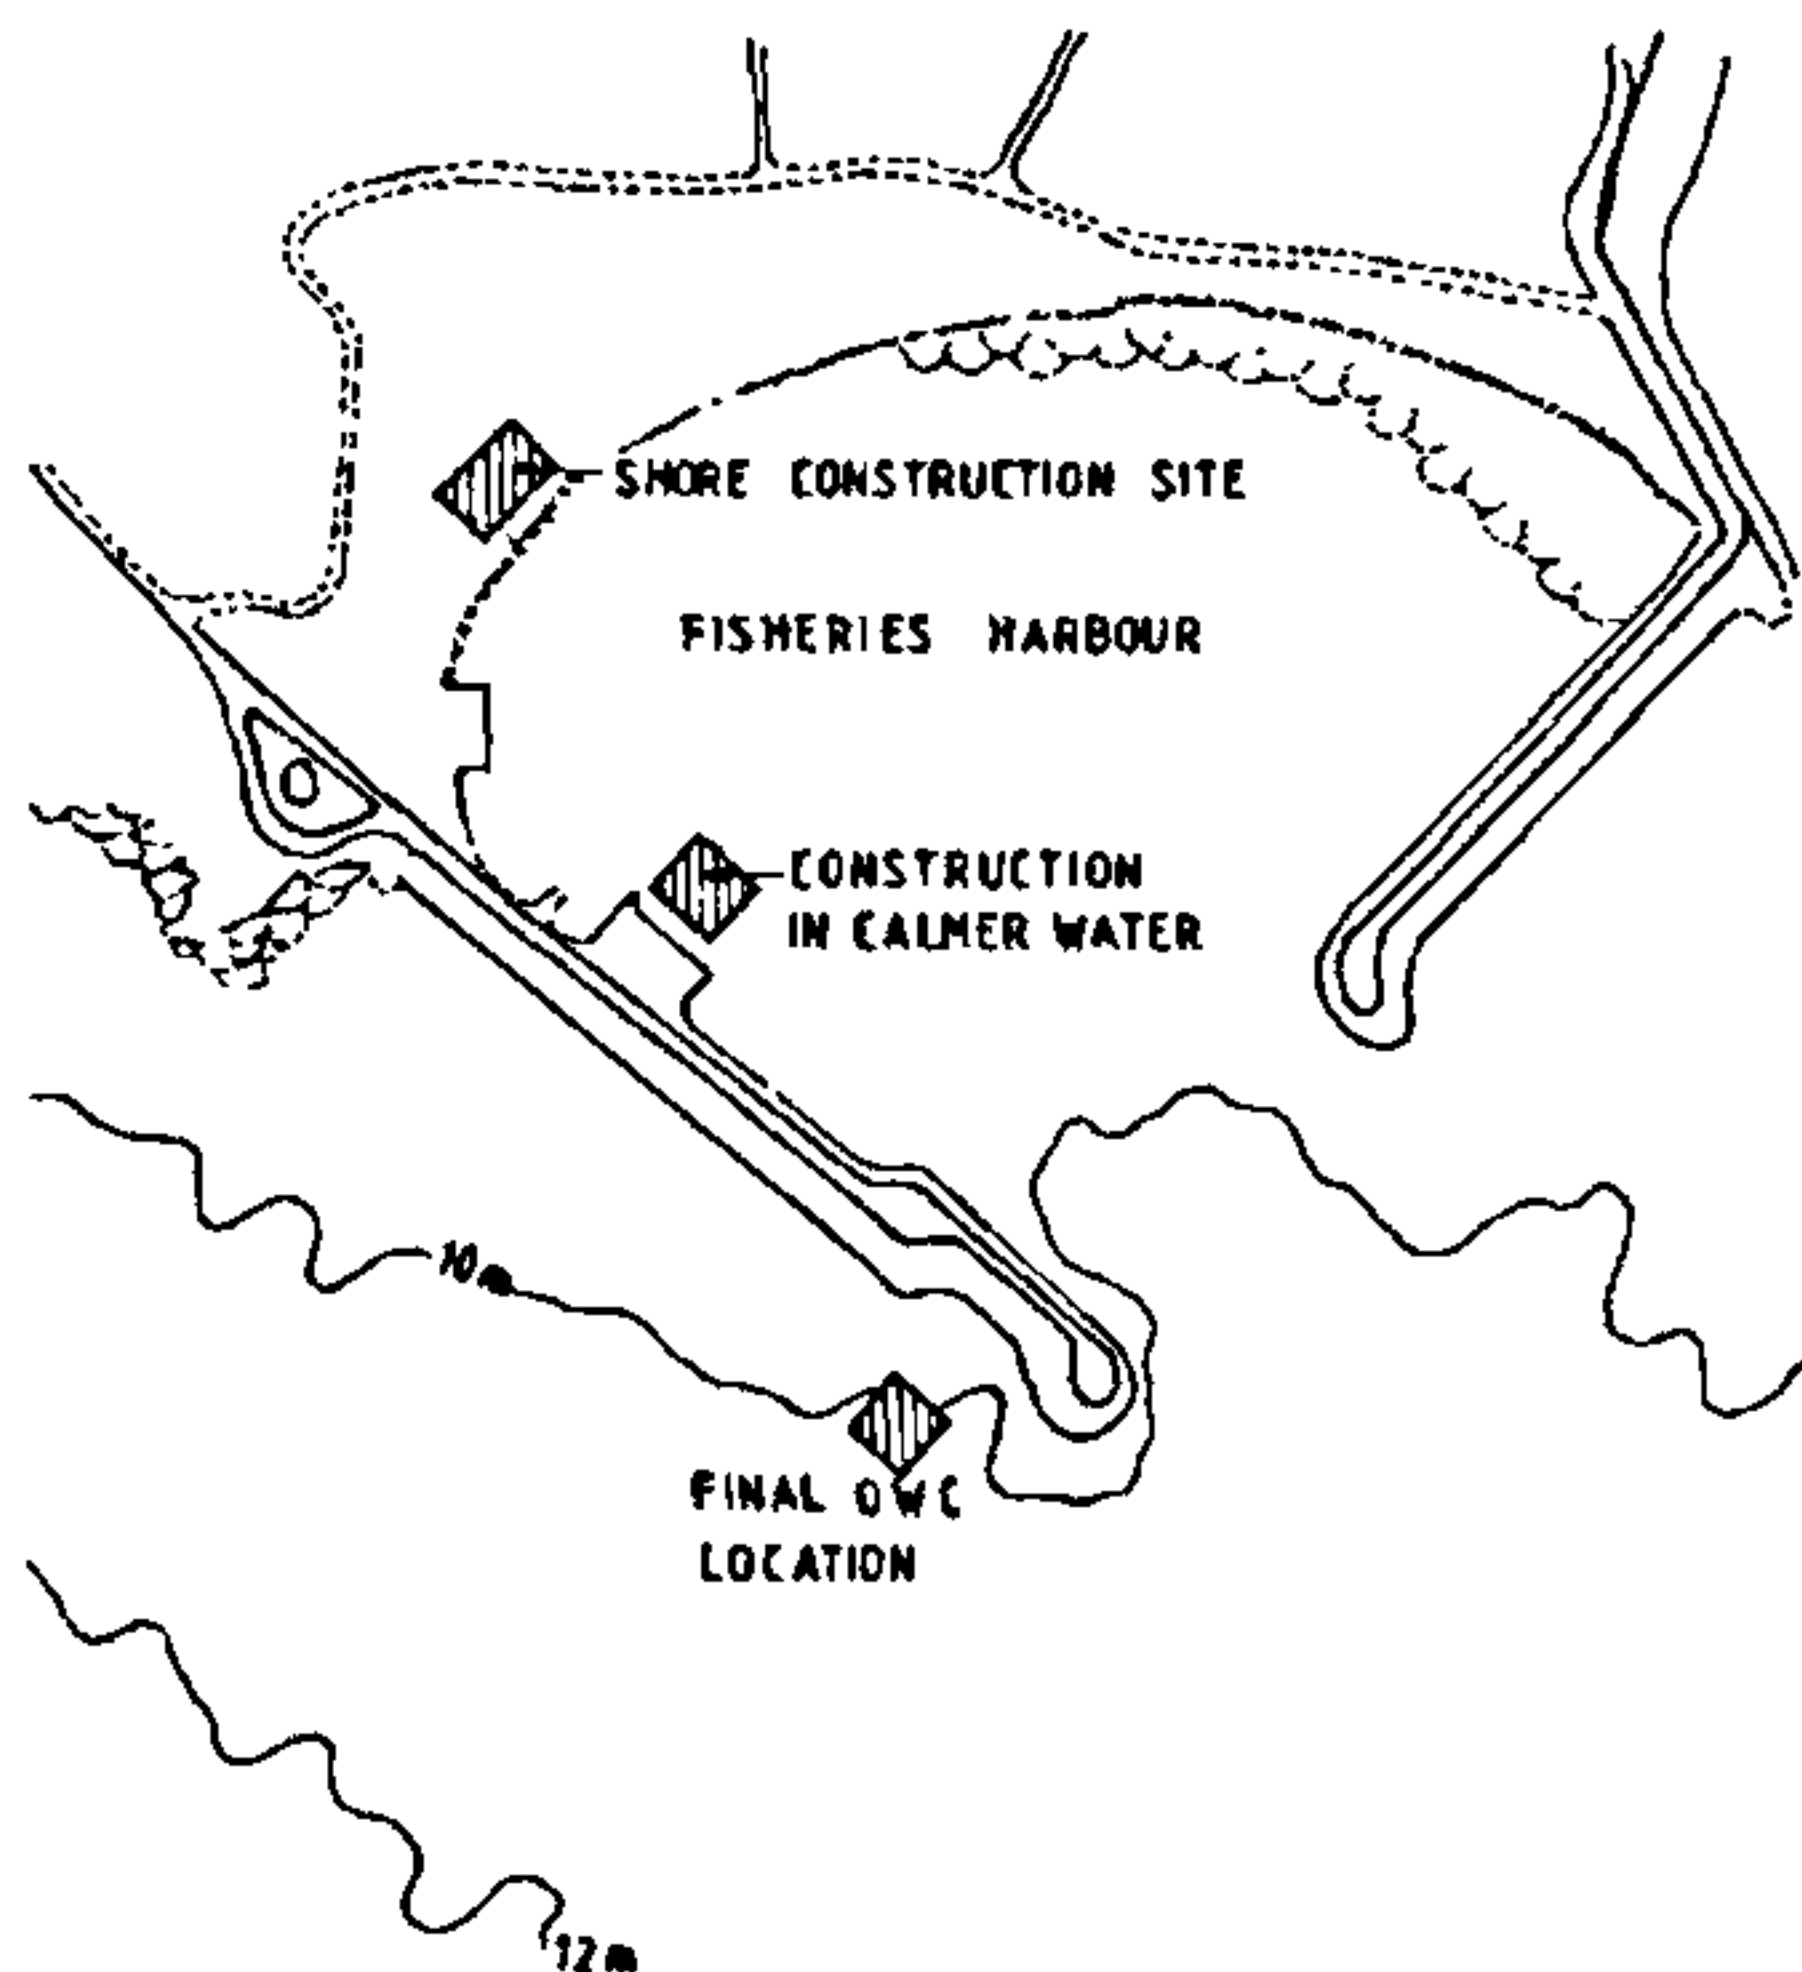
Vizhinjam harbour plan, with construction and installation sites of OWC.
